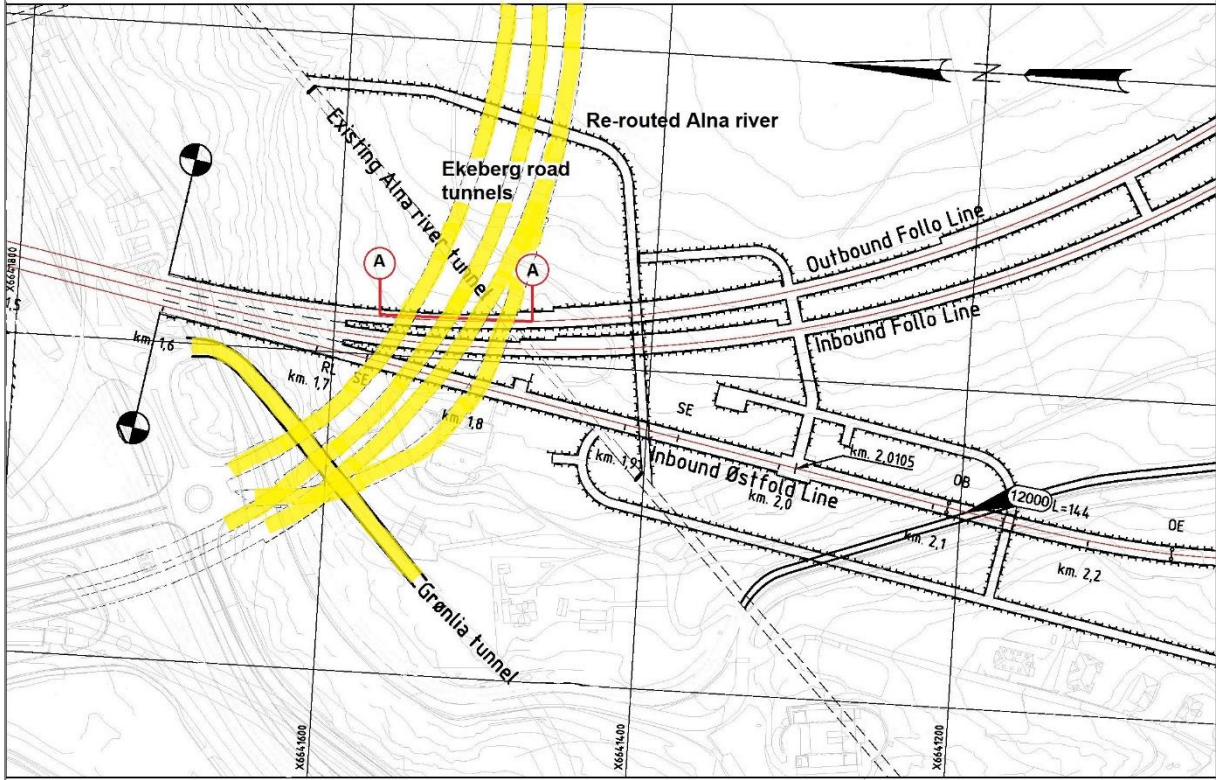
Follo line crossing Ekeberg road tunnels and Grønli tunnel - road tunnels in yellow (modified after (NNRA, 2014c))
